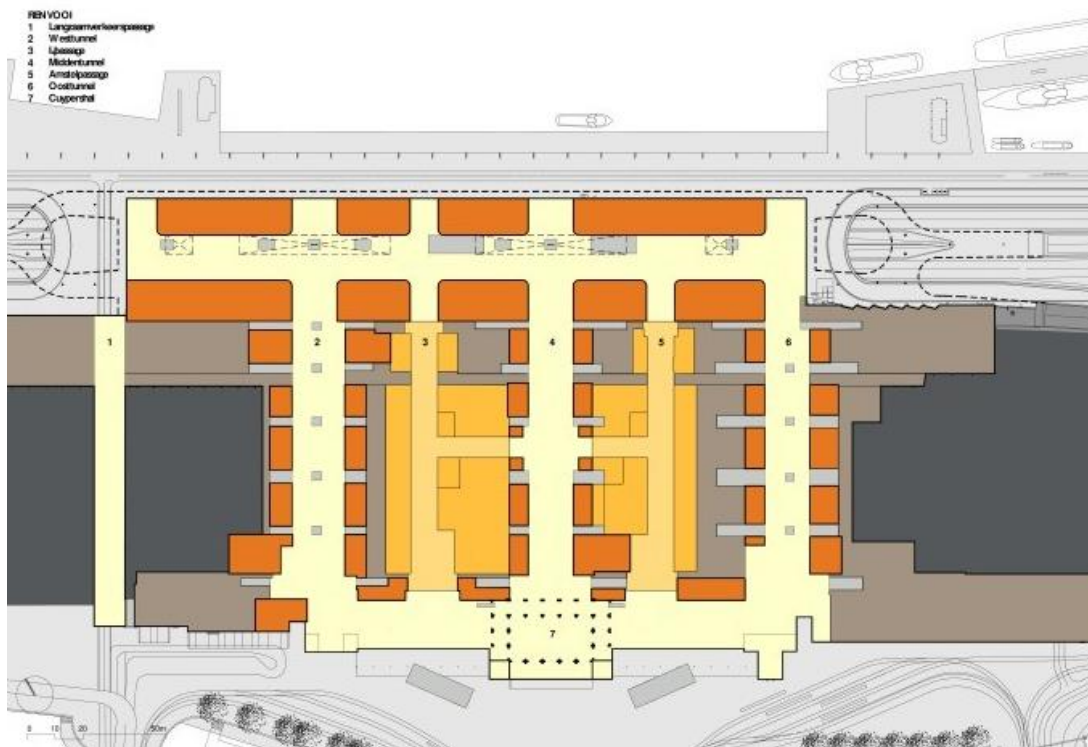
Concourse level plan of the station (source: Benthem Crouwel Architects).
